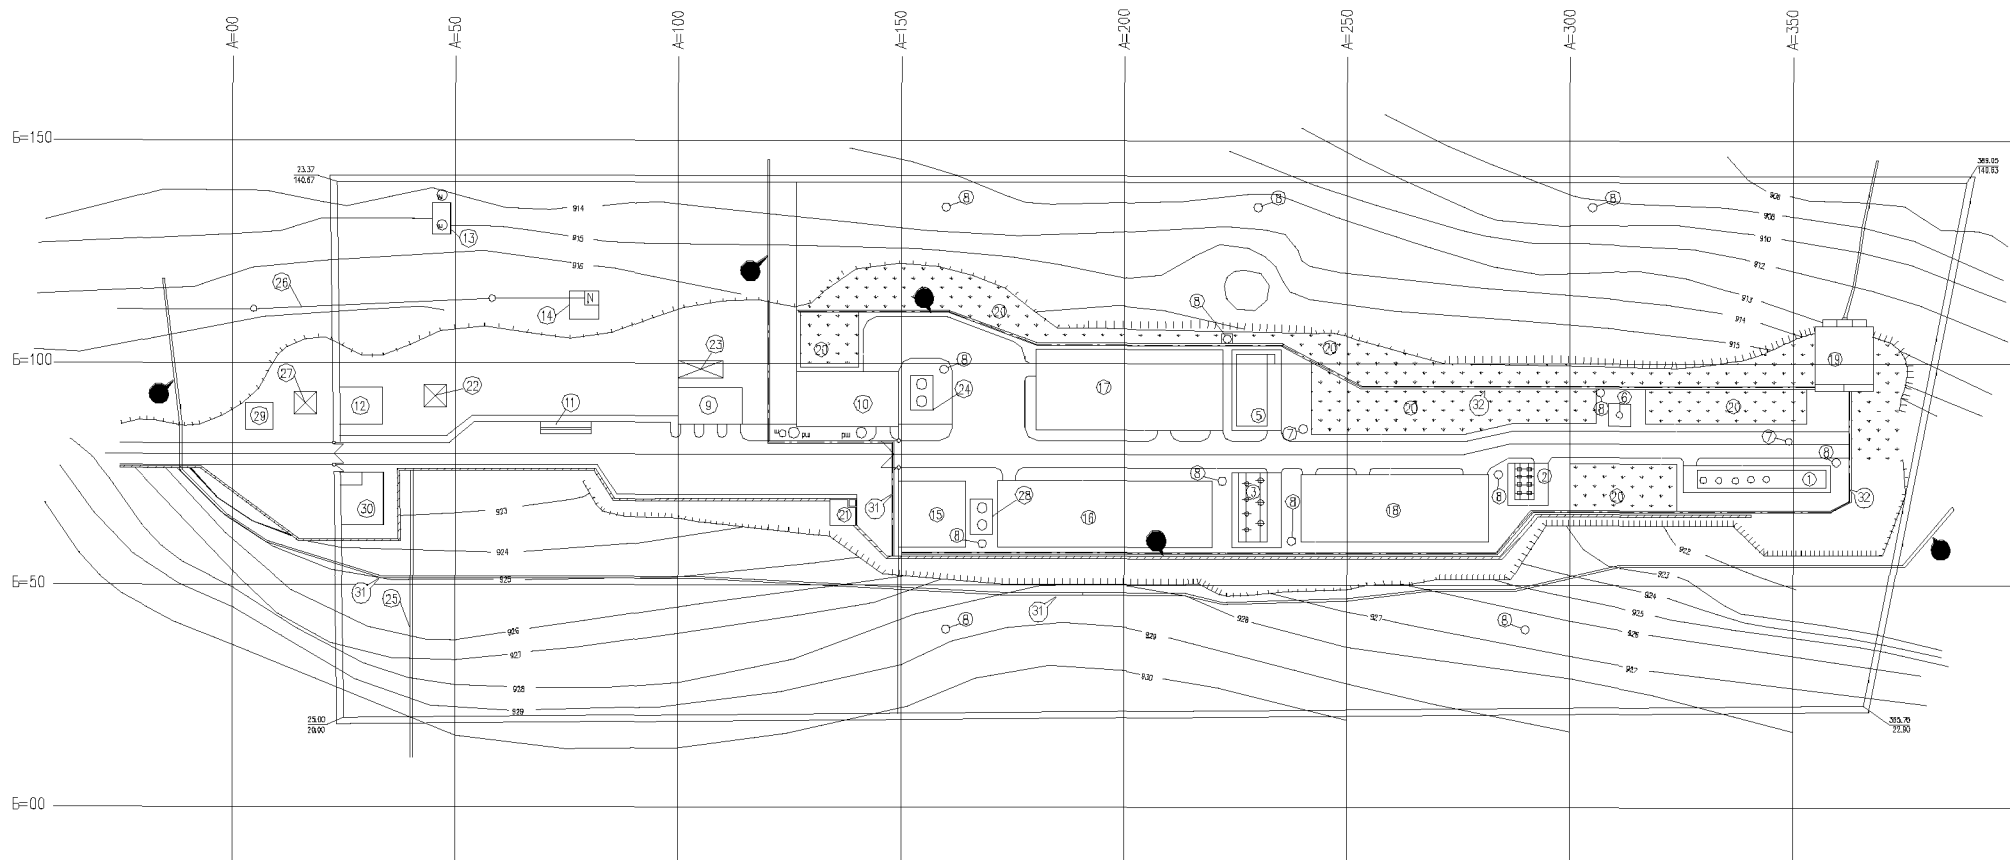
Proposed NHRWR General Layout Plan After the Modernisation
